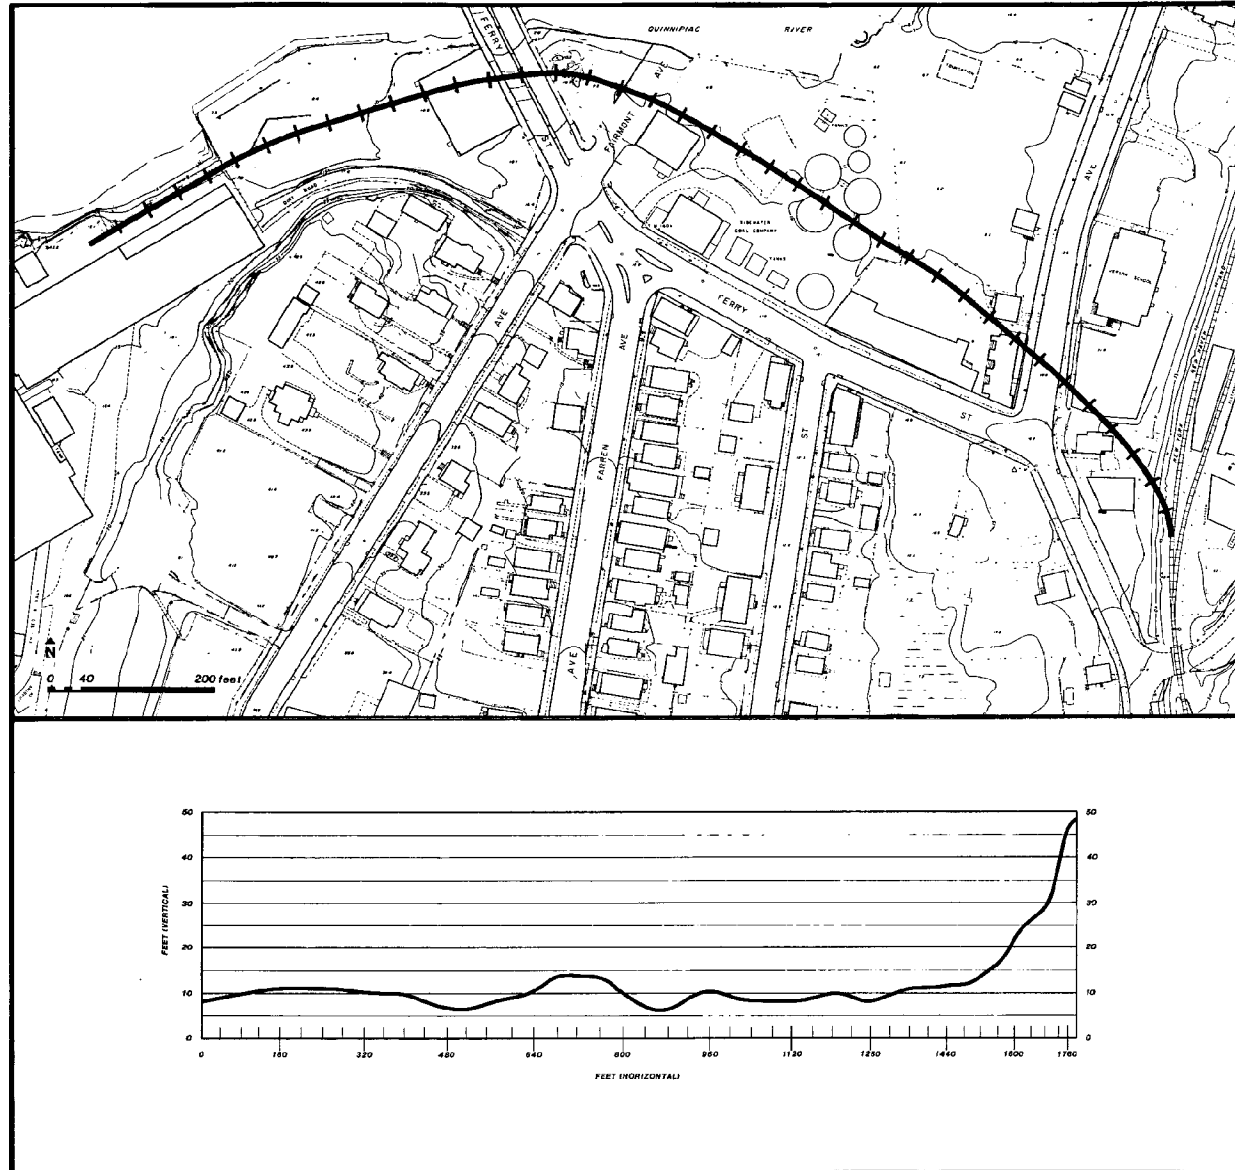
New Structure at Ferry Street. Maintaining a two to 2.5 percent grade for an "inland route" would require almost 1,600 feet of structure in riverfront areas.
